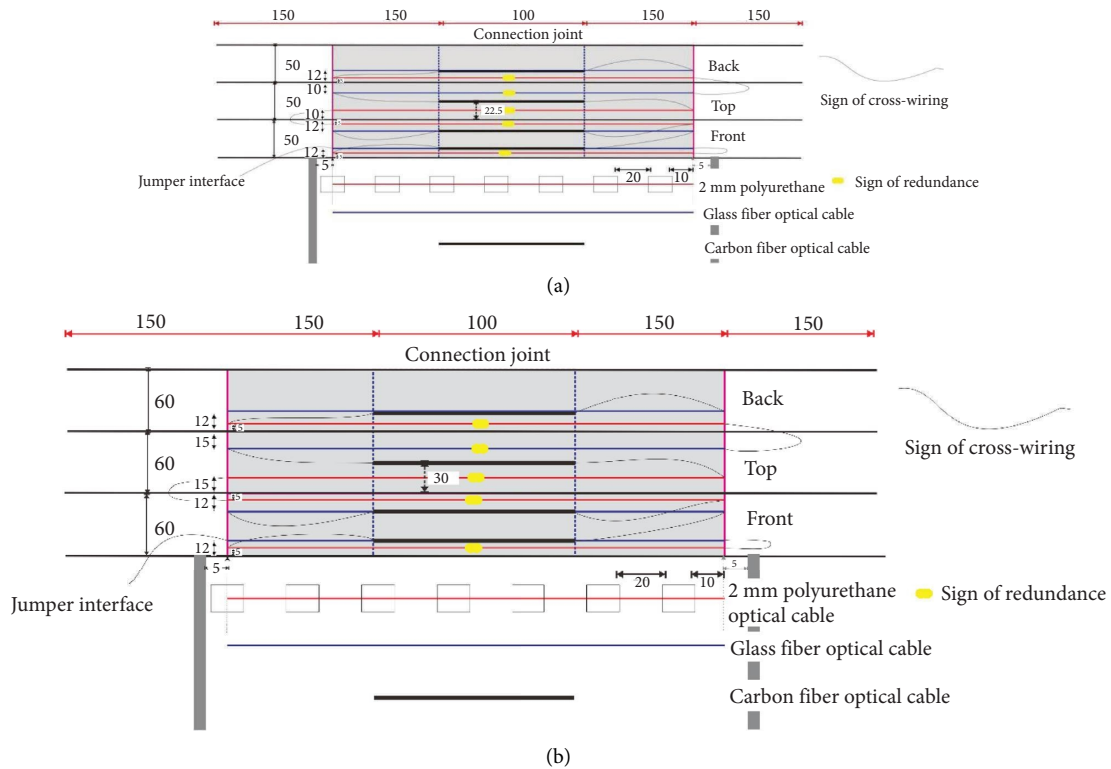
Actual layout of optical cable on the surface of CPCSP. (a) 500 mm. (b) 600 mm.
